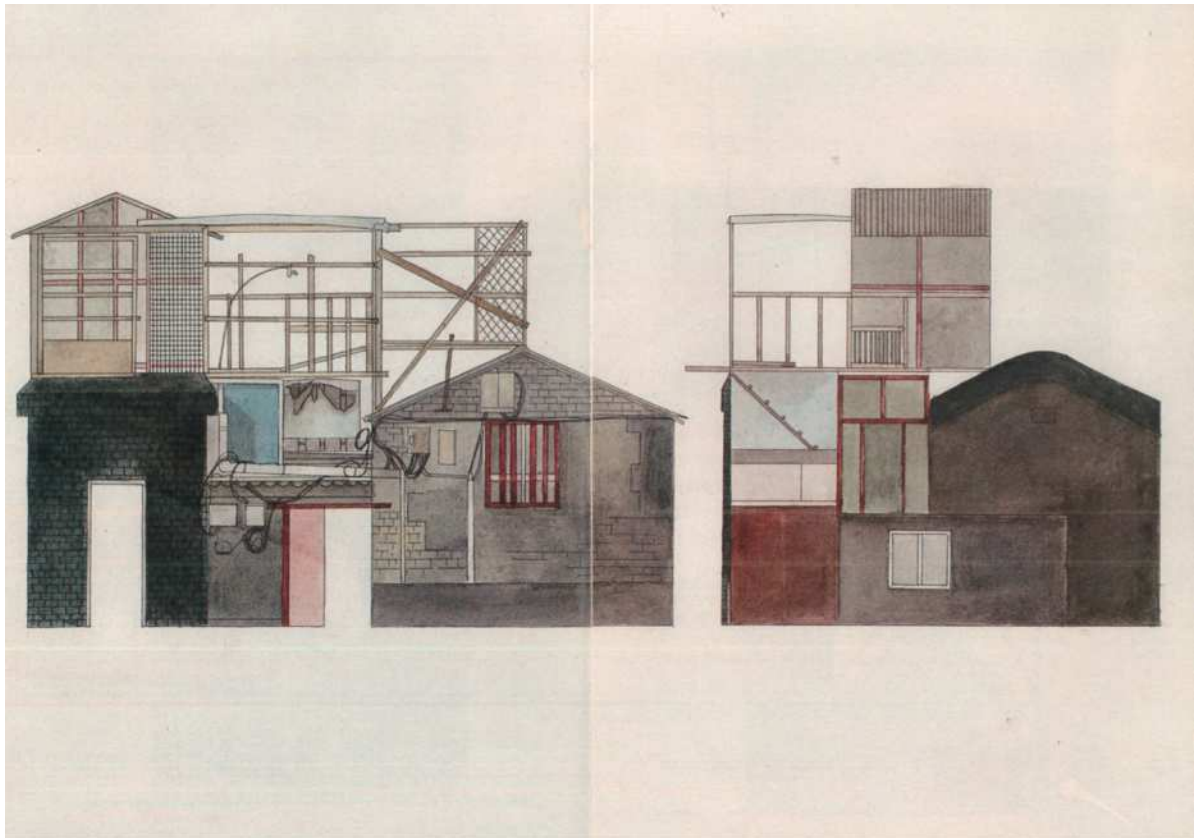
Drawing of temporary rooms and structures upon a traditional Hutong building
